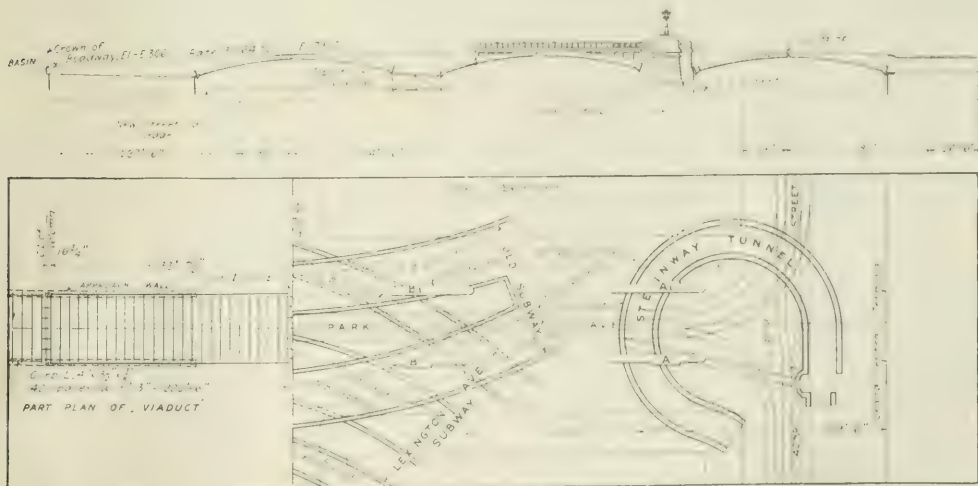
VIADUCT SUPPORT OVER COMPLEX NETWORK OF RAPID-TRANSIT SUBWAYS WHERE NEW LEXINGTON AVENUE LINE CONNECTS WITH PARK AVENUE LINE
